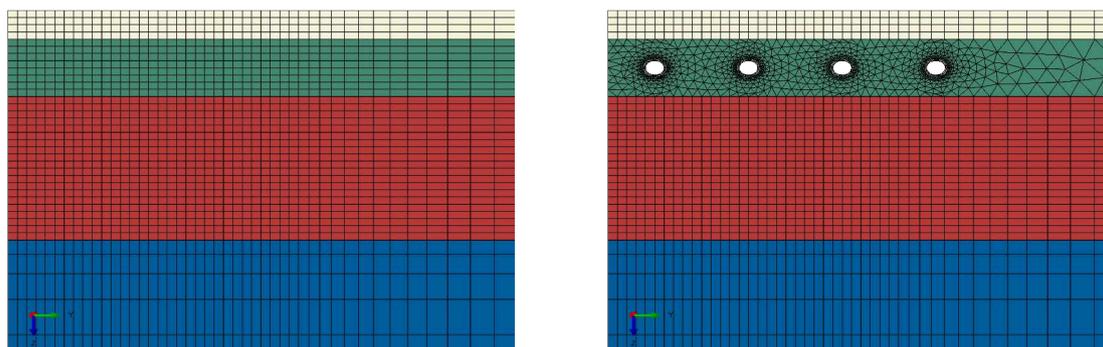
Mesh of the Finite Elements model; left: standard road construction; right: road construction with integrated pipe collector
